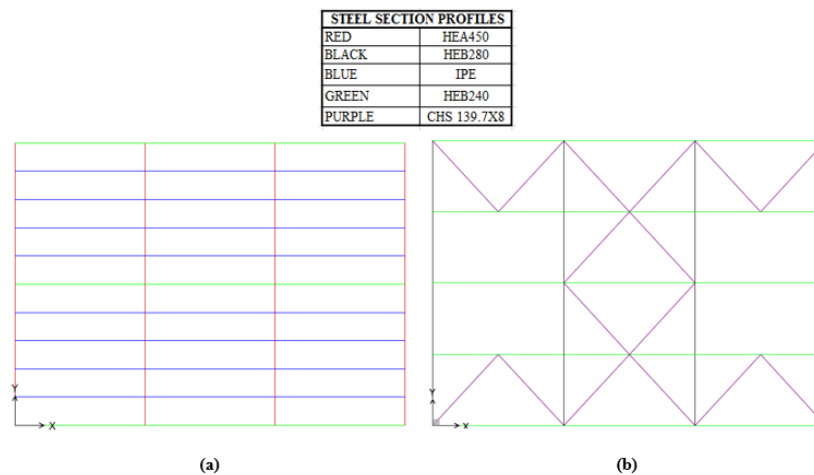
Steel Sections of the (a) Perimeter and Secondary Composite Floor Beams at 2.3 m and 7 m Heights, (b) Structural Members at the Roof Level.
